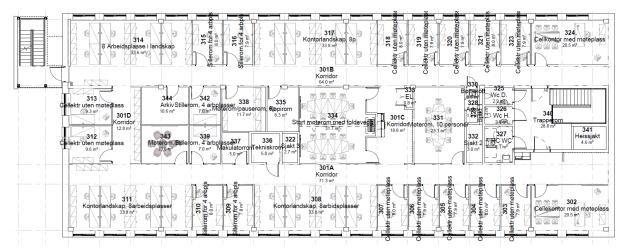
Floor plan, 3rd floor. Illustration: ABO Plan og Arkitektur.
